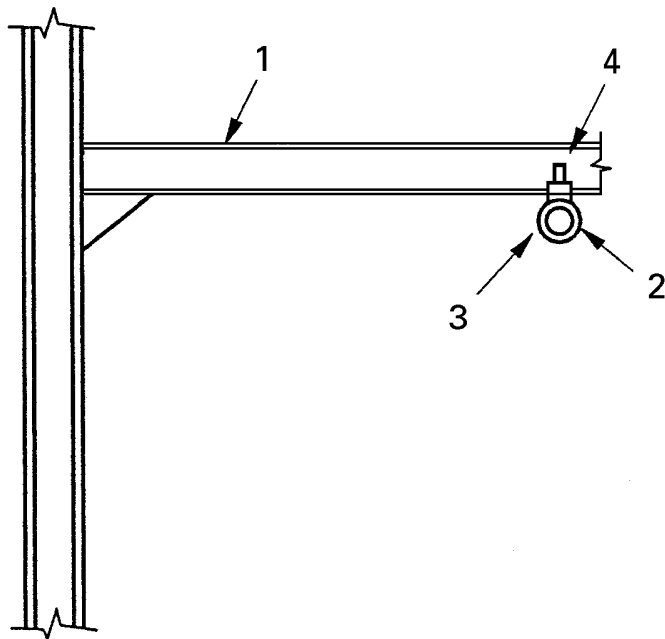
Example of a PPE anchor (Column, davit and brackets)
